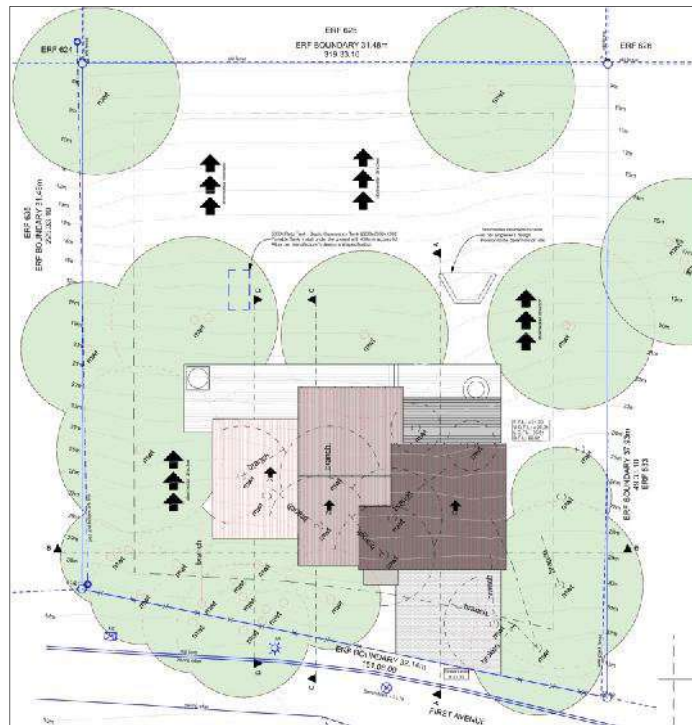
Site plan of the proposed dwelling, showing the coverage by the house and the locality of the surveyed Milkwood trees (DEM TECH, 2020)
